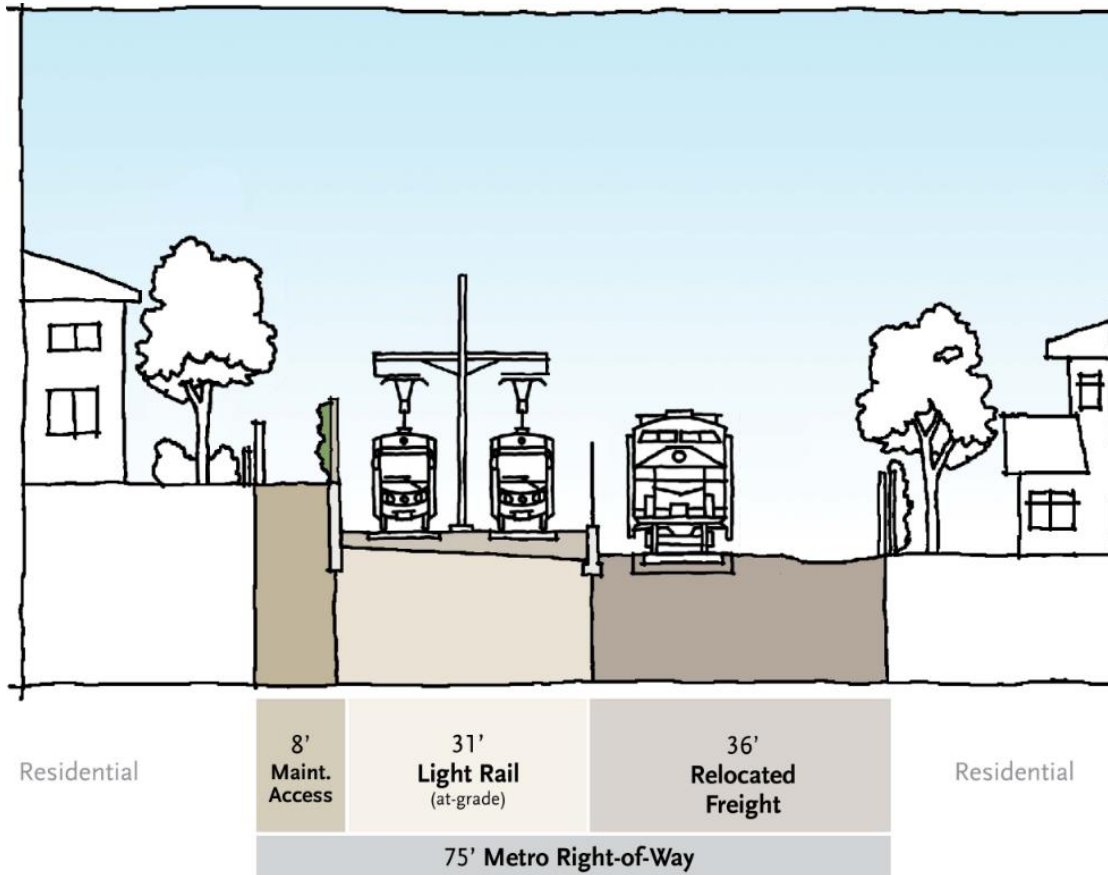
Proposed Project – Looking South Between 165th Street and 170th Street
